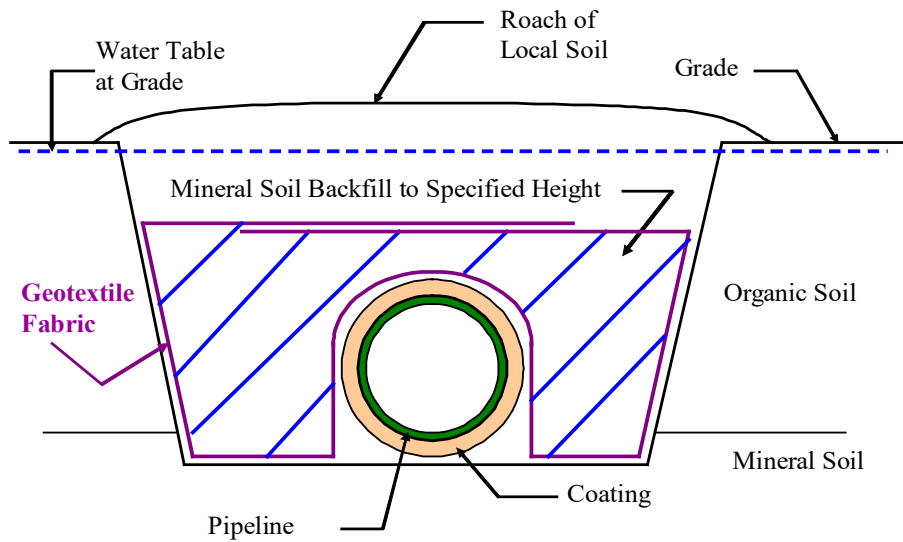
Soil Filled Geotextile “Wrap Weight” Schematic
